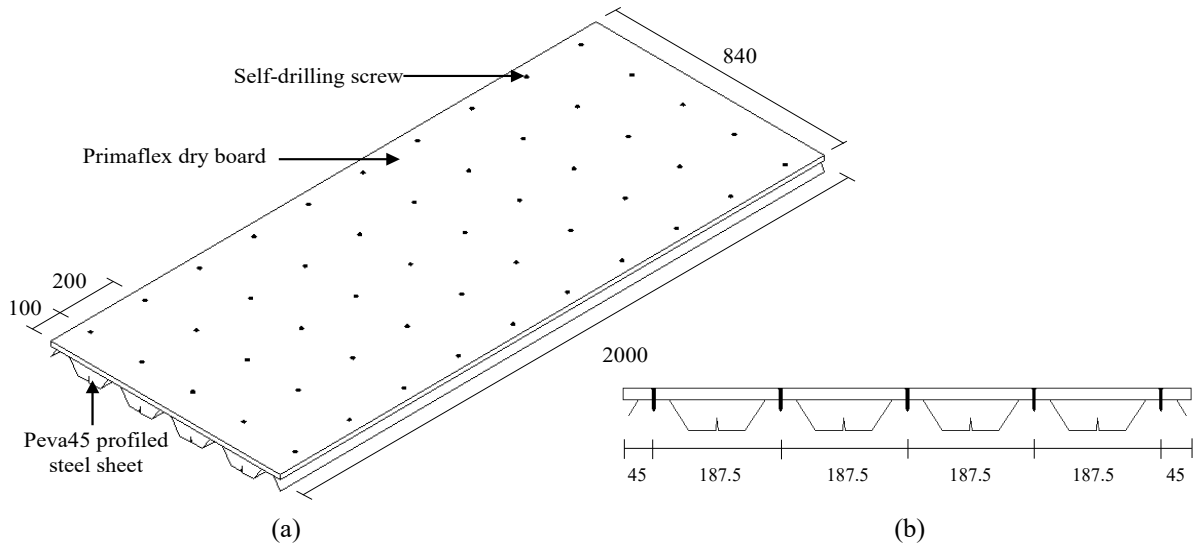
Schematic diagram for PSSDB composite slab system without infill material (a) 3D view; (b) cross-section
